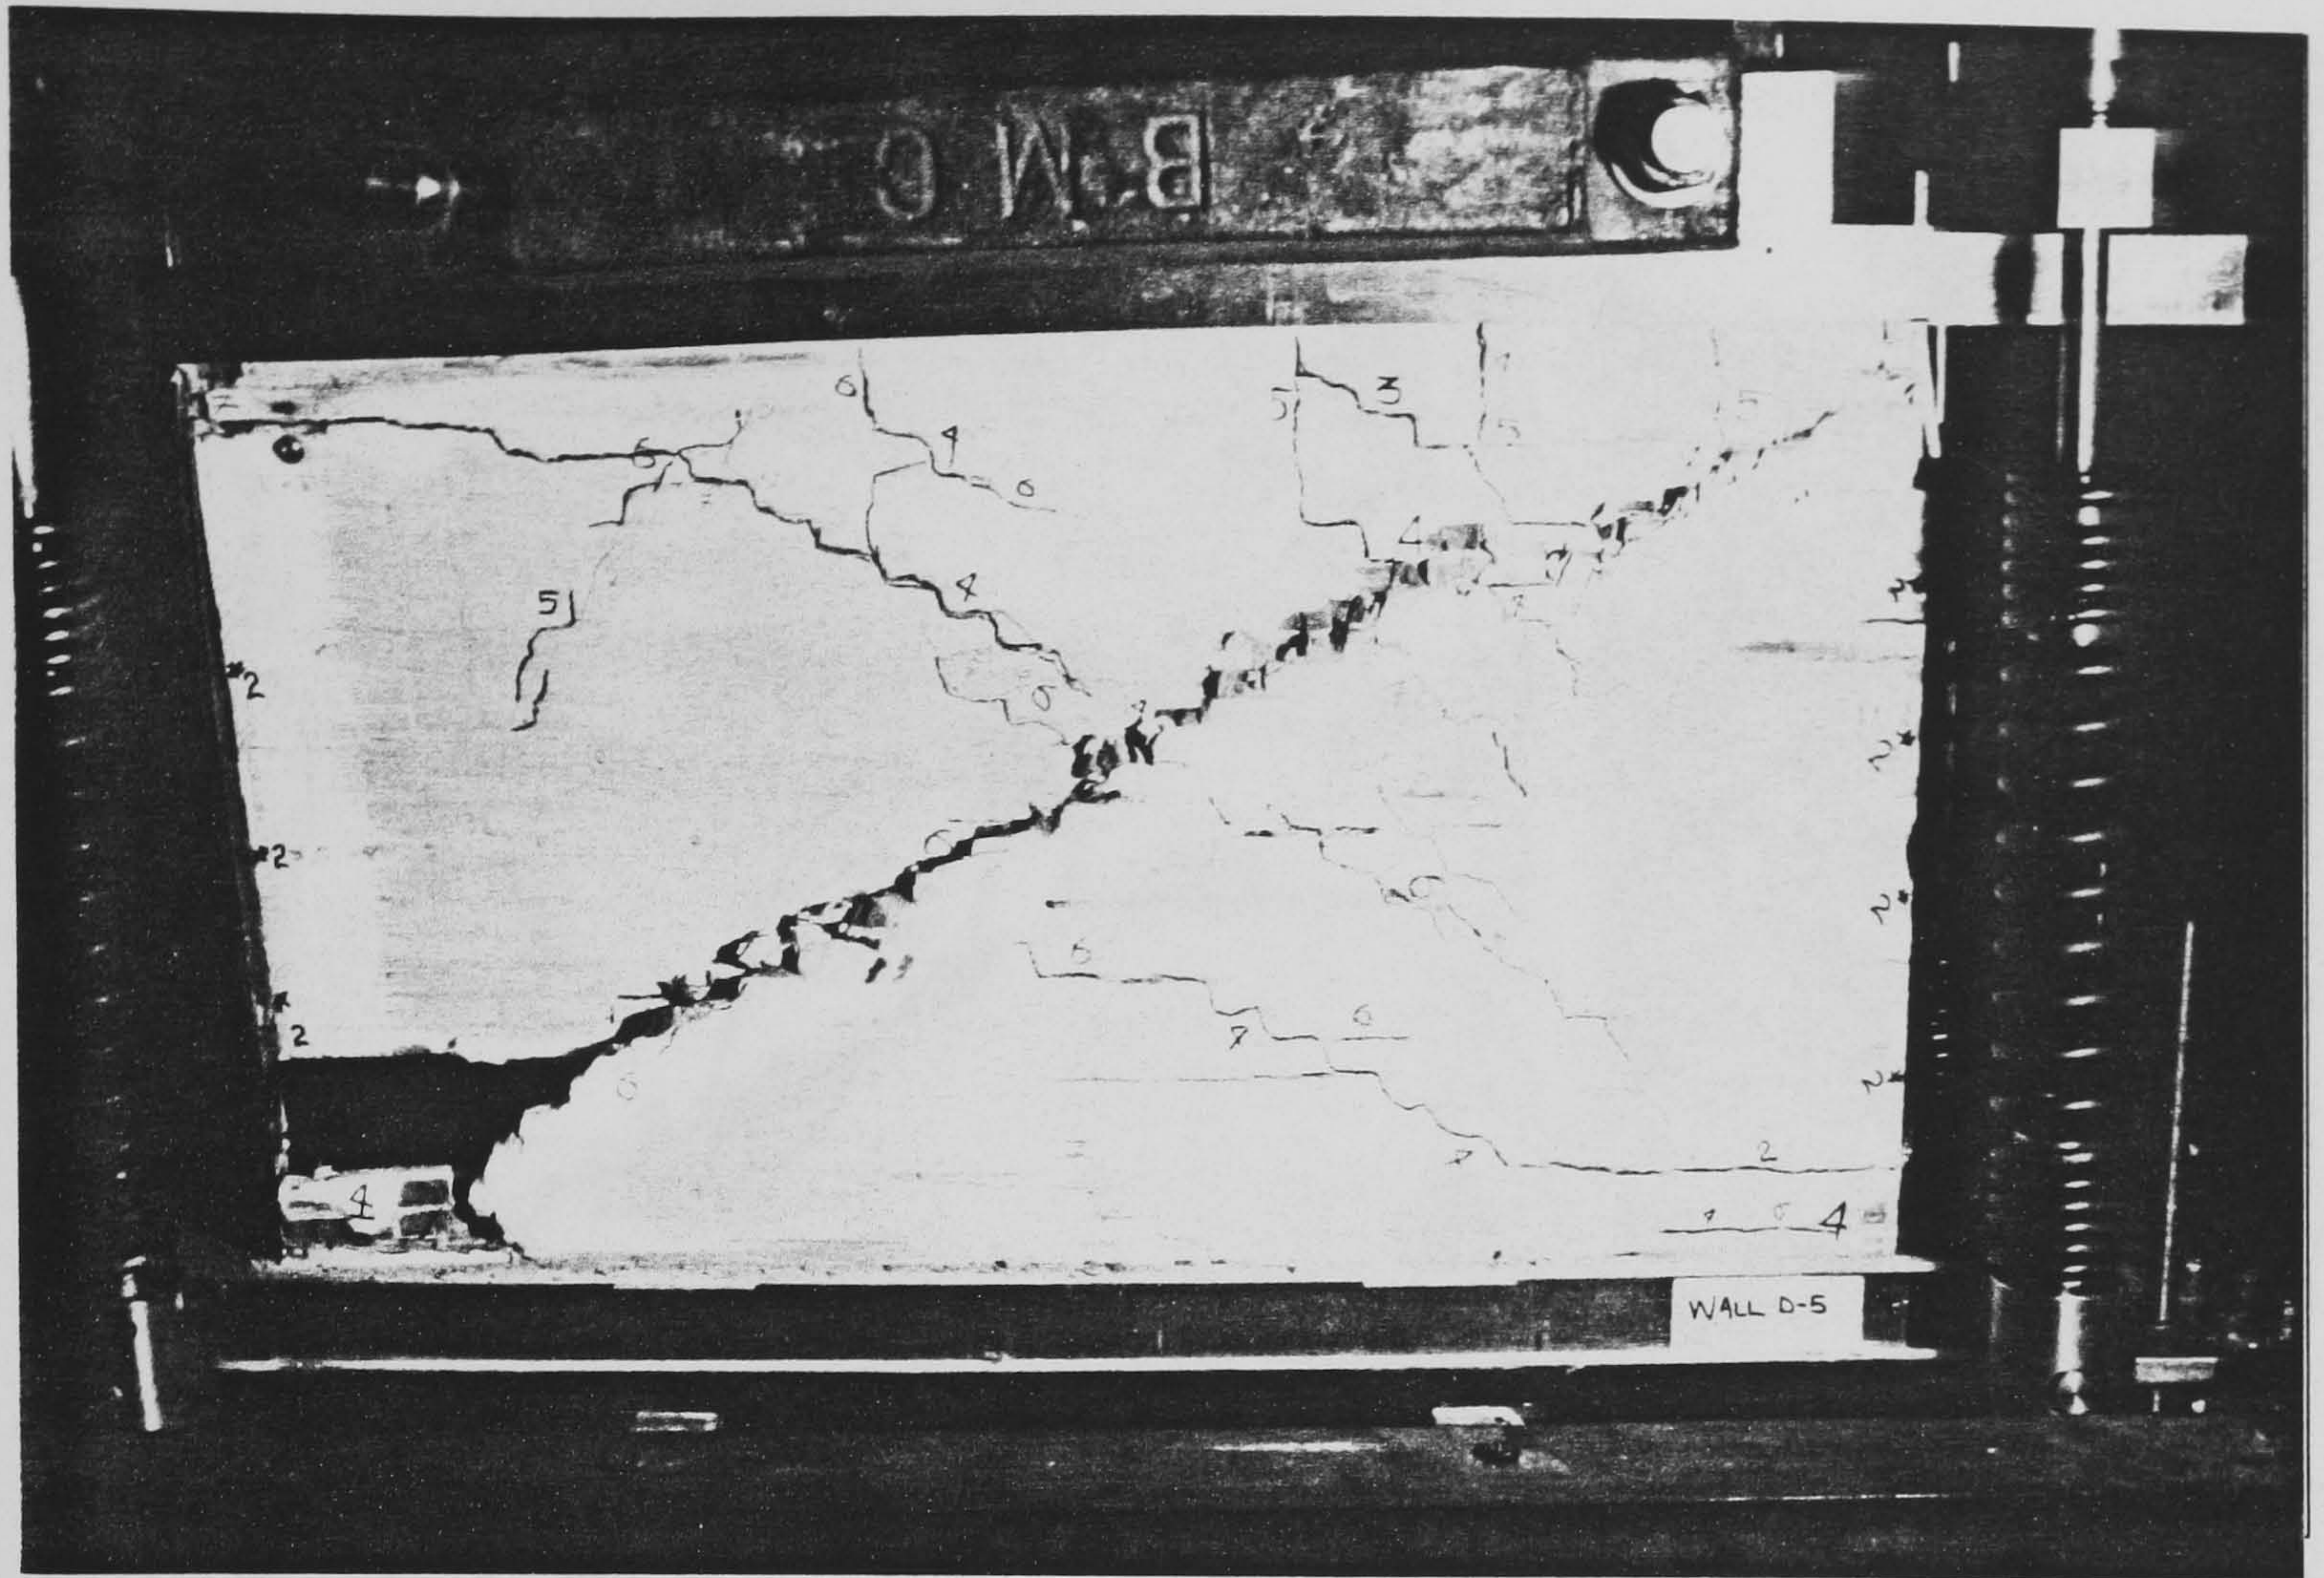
Collapse sequence-frame 7 (wall-D)
